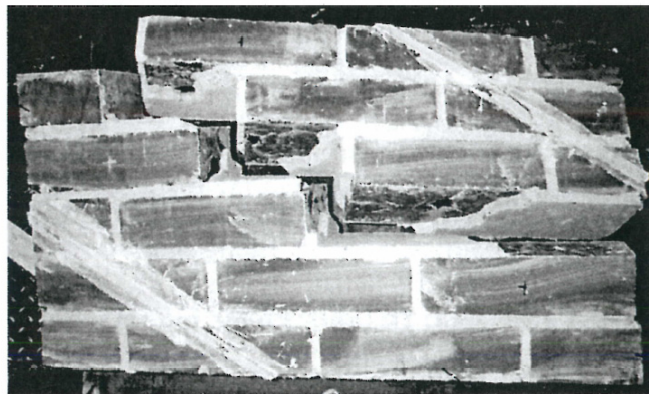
Diagonal bending specimen failed specimen (picture from [4])
